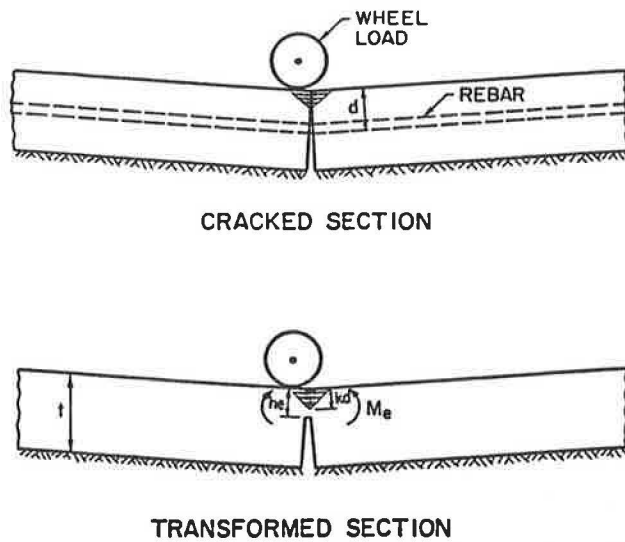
Transformation of cracked CRC pavement section.
